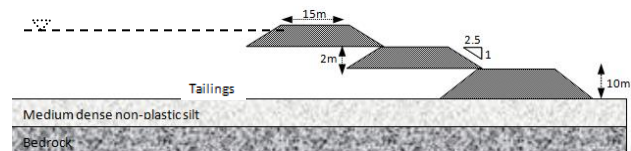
Cross section of the external retaining dikes after three construction steps with the upstream method.
